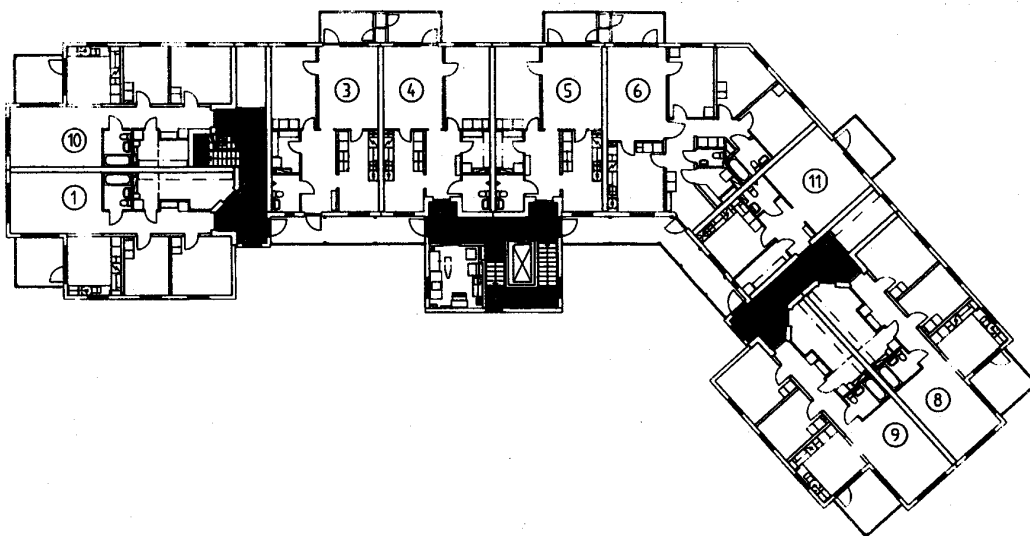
Plan showing a typical floor. The building is divided into 36 apartments, which are connected to two separate stairwells by access balconies. [40]
